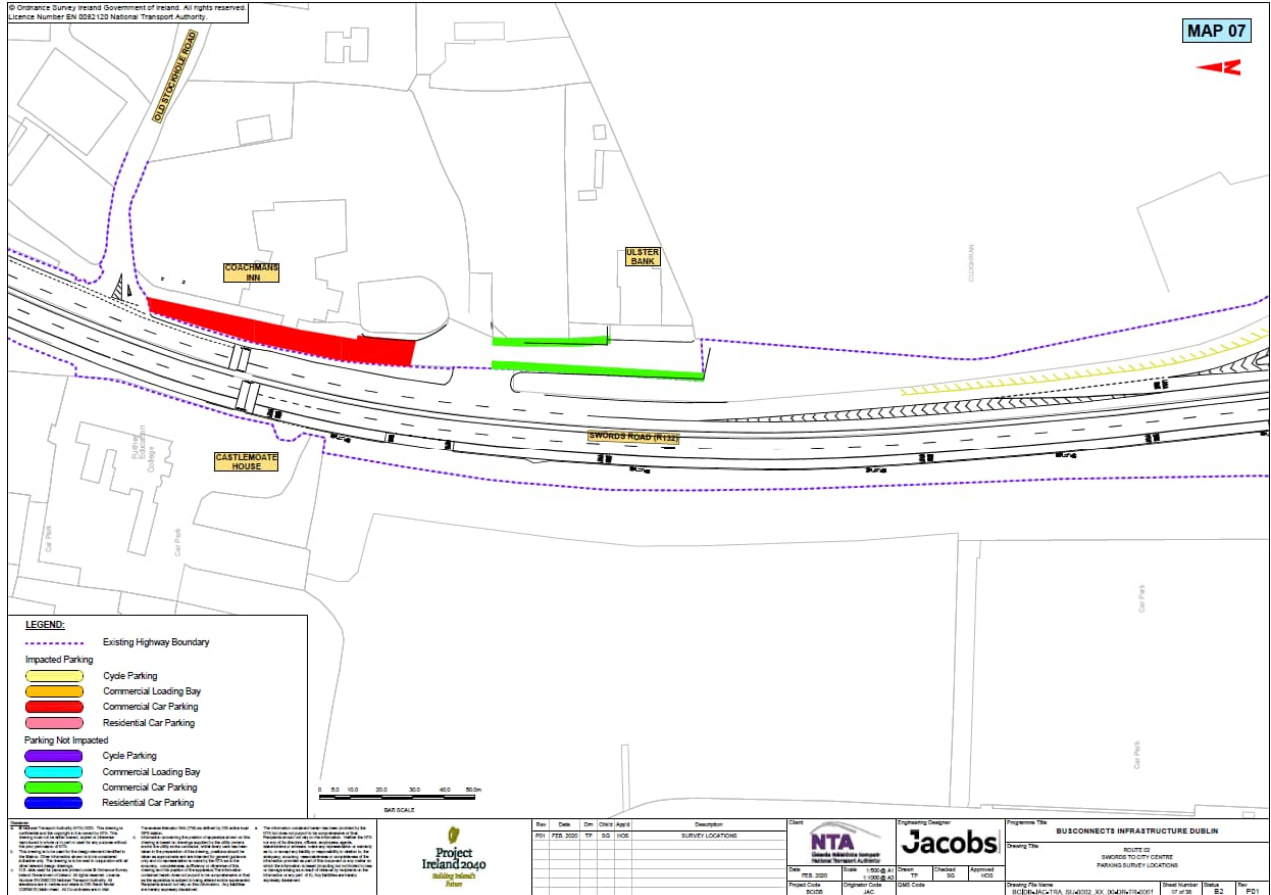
Existing Parking – Coachman’s Inn, Swords Road / Old Stockhole Road
